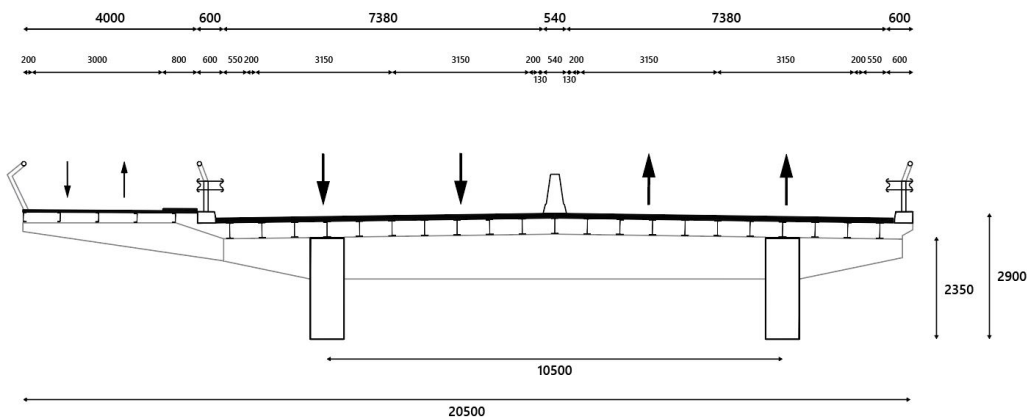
Transverse cross section of the Beneden Merwede Bridge including current traffic directions and dimensions
